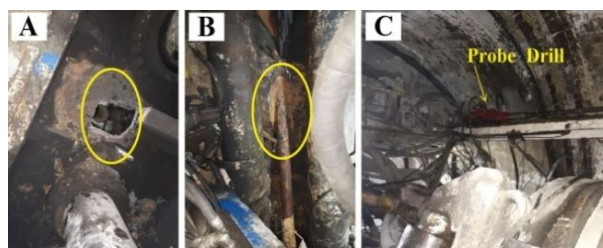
A- Installation of probe drilling holes in the middle shield. B- Conductor pipe is installed on holes. C- Probe drill.
